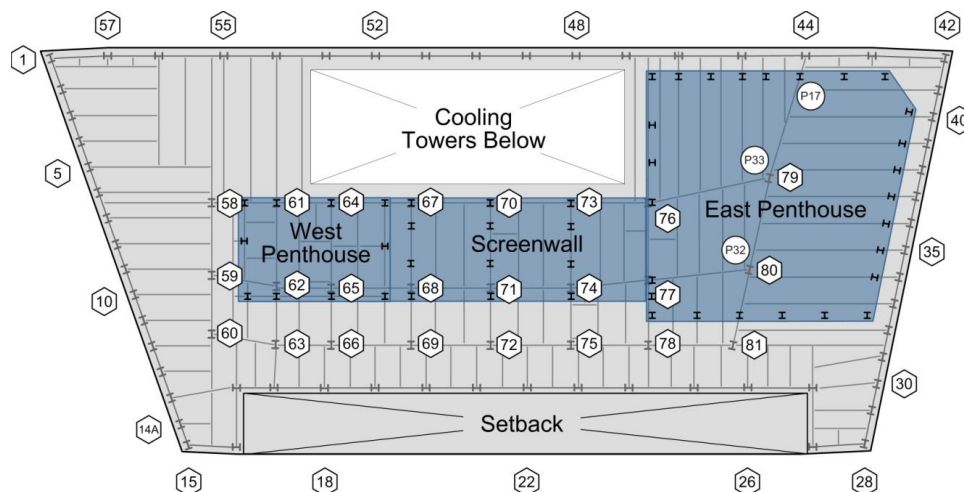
Floor 47 framing plan [2]. Based on structural drawings [15].
